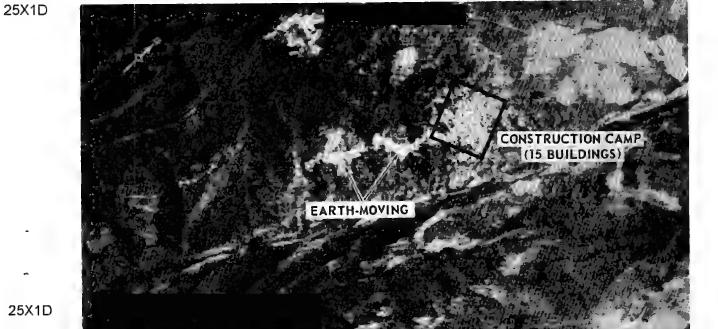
ROAD CONSTRUCTION(22-01N 101-27E) YUN-NAN PROVINCE, CHINA
